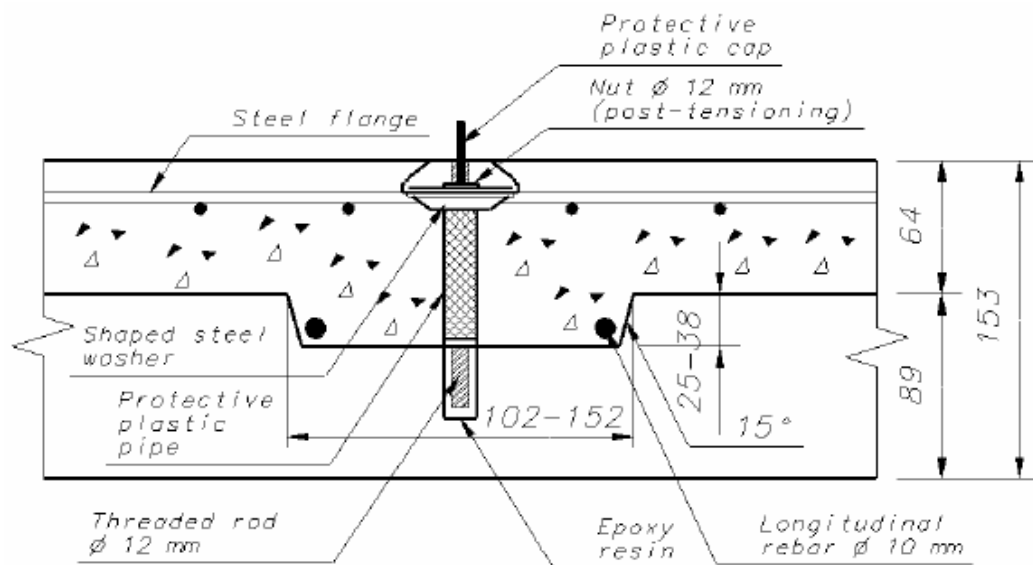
Shear key connection detail (Gutkowski 2004) (dimensions in mm)
